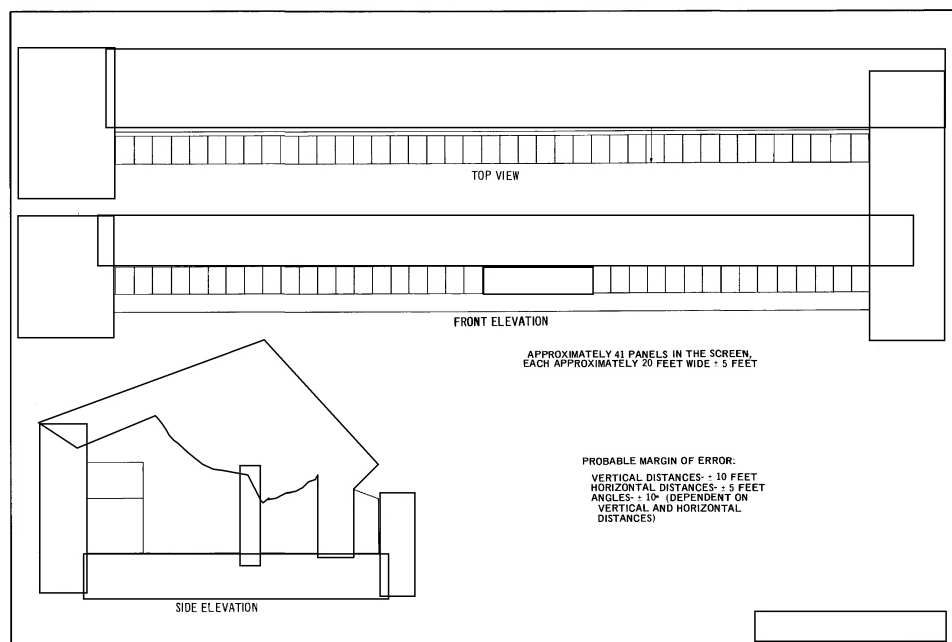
ELEVATIONS AT SSATC RADAR SITE 1.
